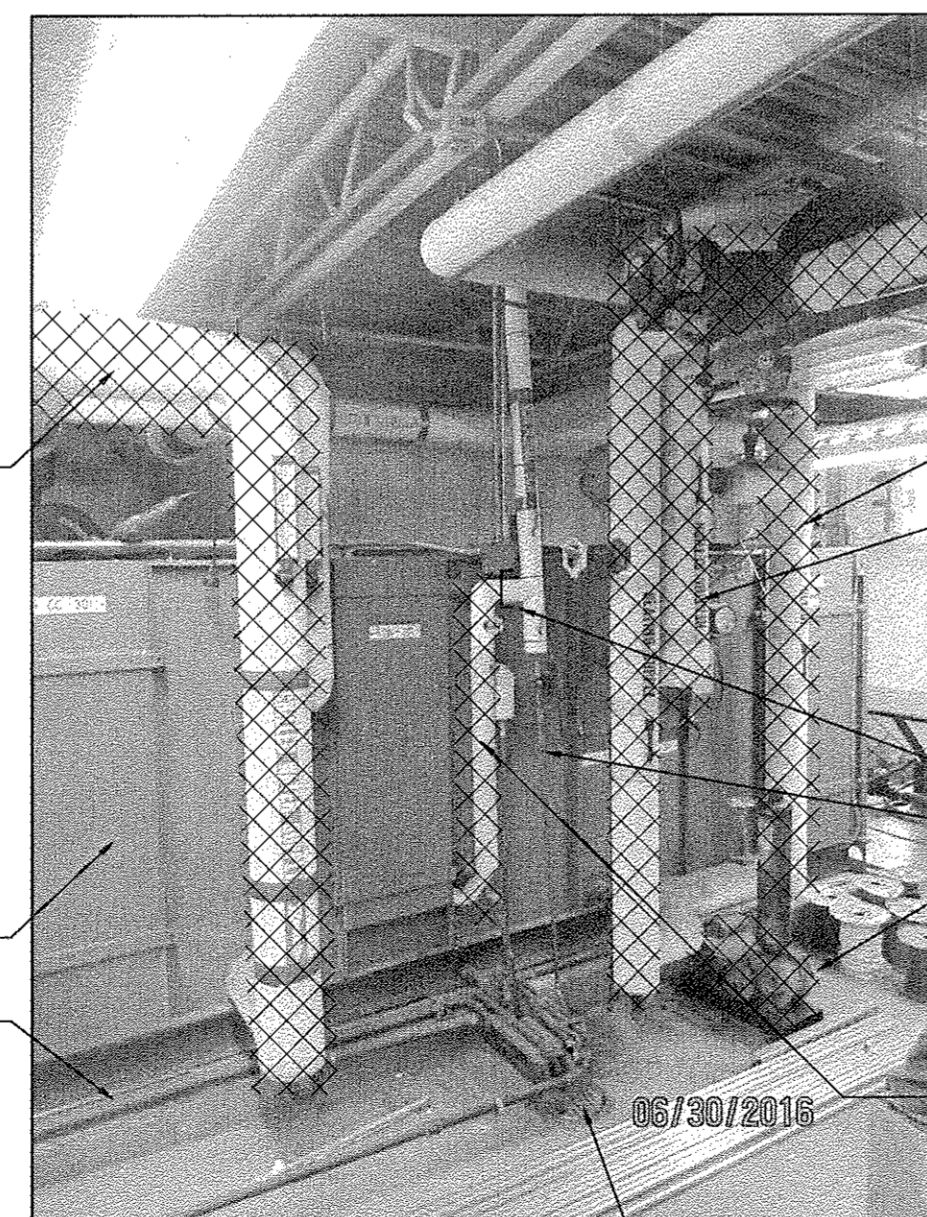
LOOKING NORTH VIEWING EXIST. AHU-301
